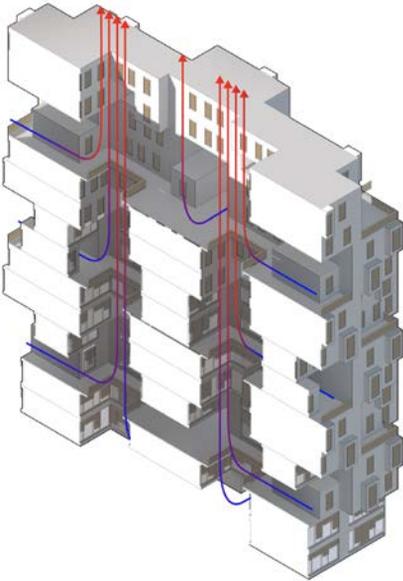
Axonometric section view. Through convection (stack effect), air rises through the internal vertical shafts providing natural ventilation. Air is sucked in through the holes connecting the shafts to the outer facade. Air flows over a system of water pools and vegetation for additional cooling.
